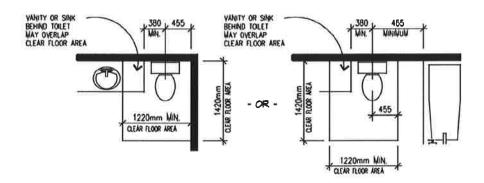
CLEAR FLOOR AREA AT TOILET
